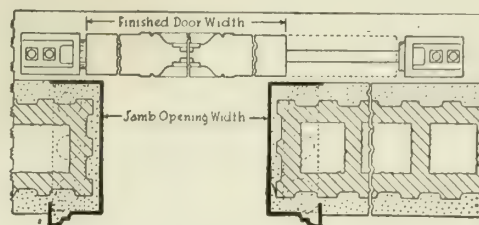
SPECIAL MOULDED STEEL BUCK FOR SINGLE SLIDING ELEVATOR DOOR
